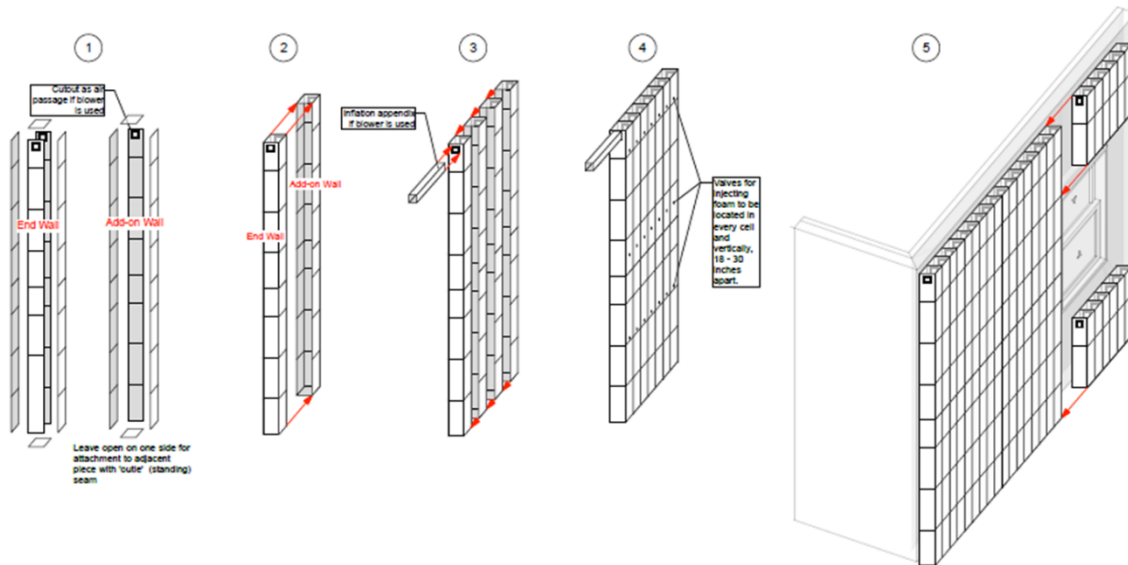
Shows the flexibility in construction and the accommodation around a wall. Unit cells can be constructed in a variety of lengths and preassembled and delivered to the job site fit to size or can be pieced together at the job site.
